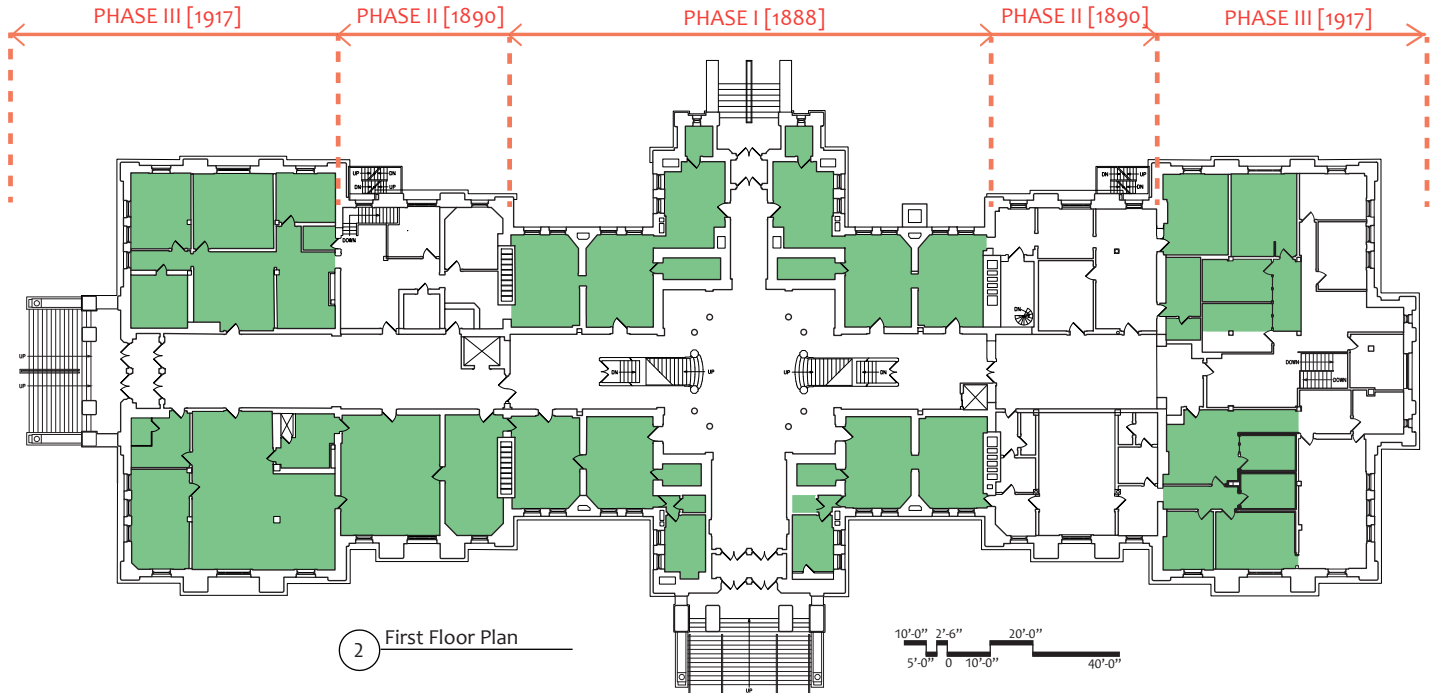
First Floor Plan [Office Suites highlighted in green]
